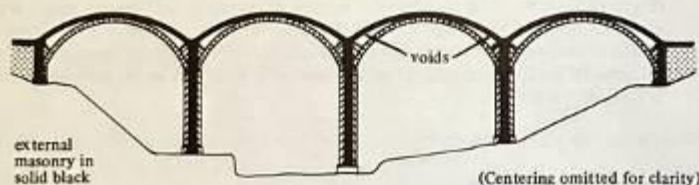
A - Dean Bridge - Progress of masonry work on striking upper arch centering.
